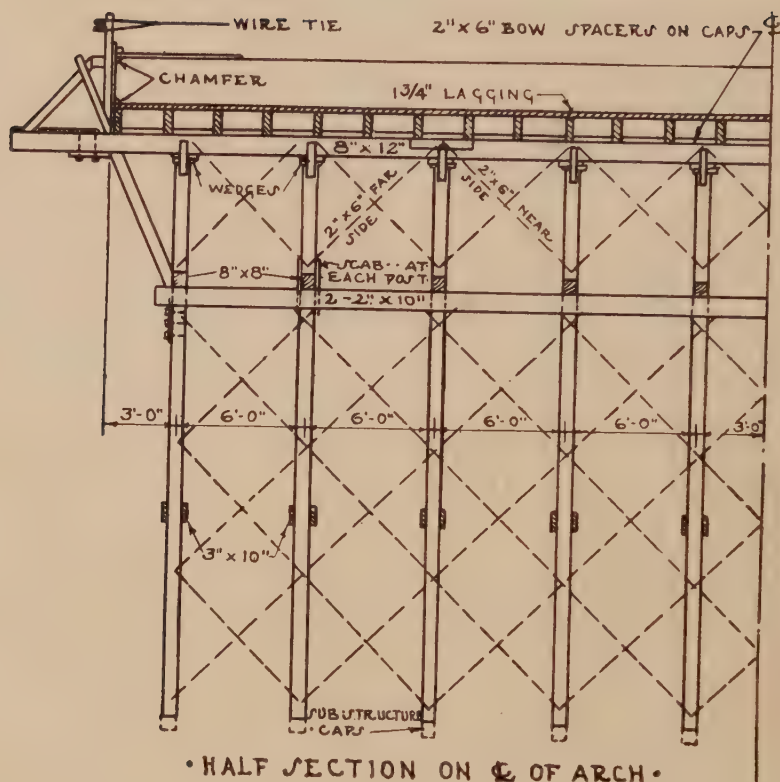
Cross-section of arch centering shown in Fig. 216.
